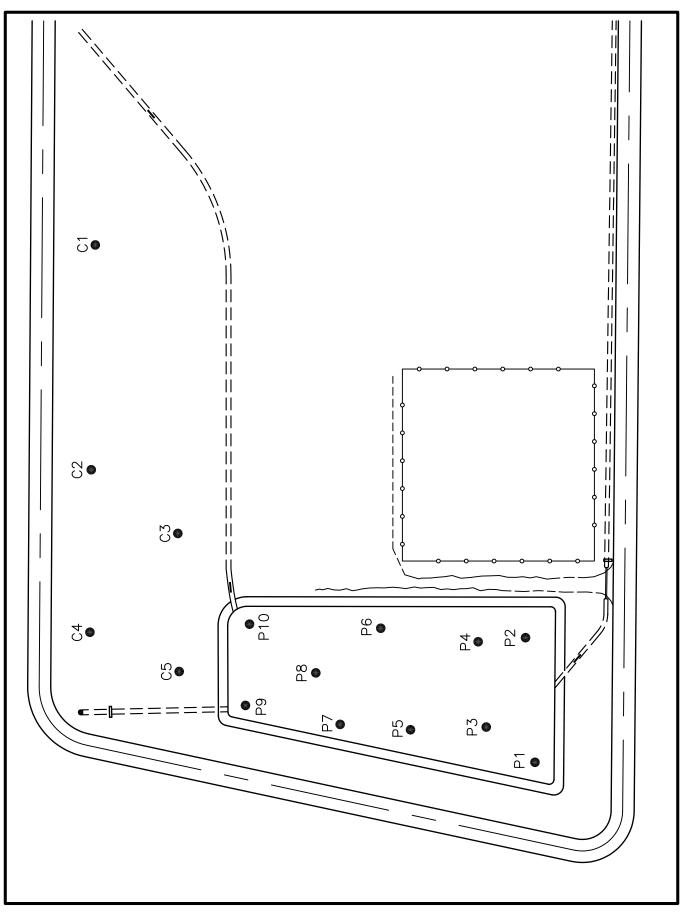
Soil Monitoring Sites for the Key Colony Detention Pond Study Site.
